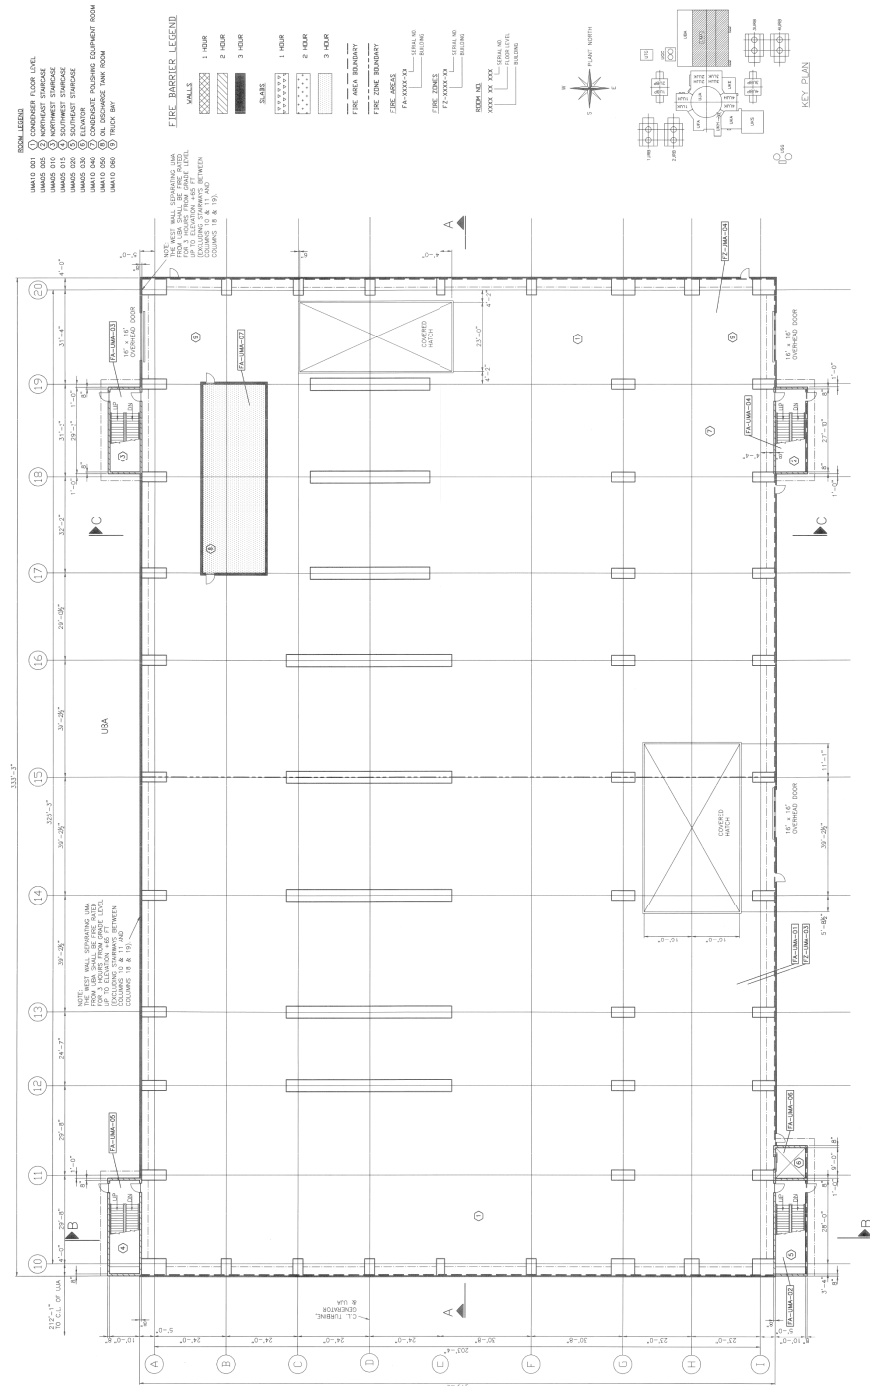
B-3—{CCNPP Unit 3 Fire Barrier Location, Turbine Building Plan at Elevation +38 Feet}
